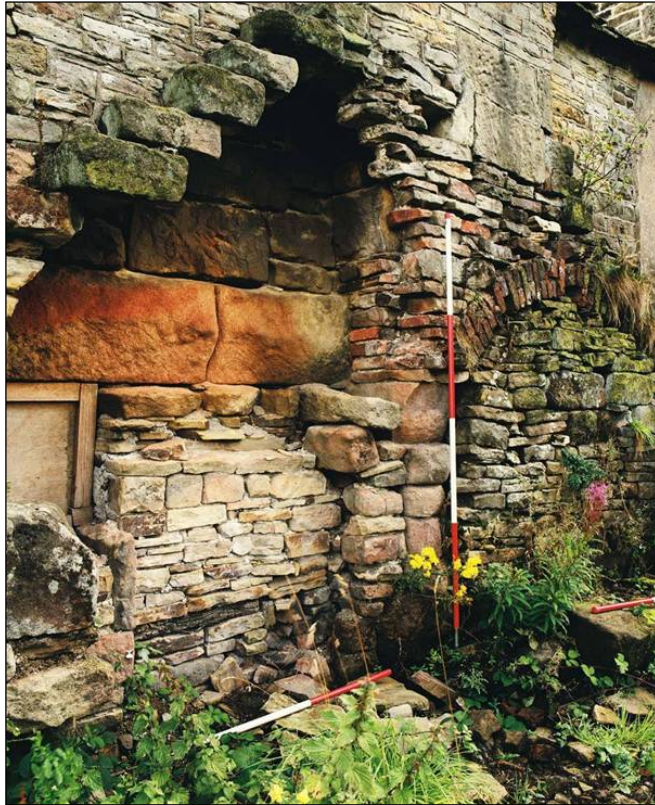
Detail of exposed flue in west facing elevation (film 1.08)
